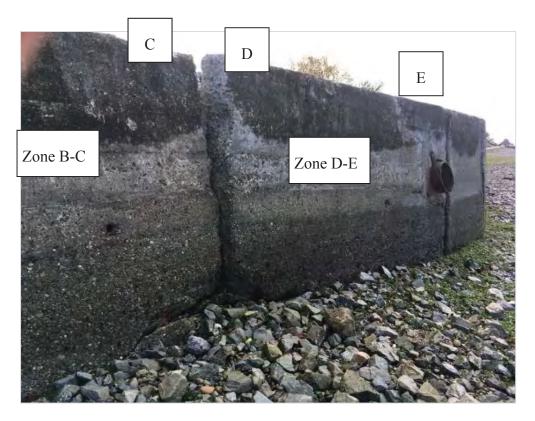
Zones B-C & D-E, Outfall. Source: Reid Middleton Site Visit 10/18/2016
